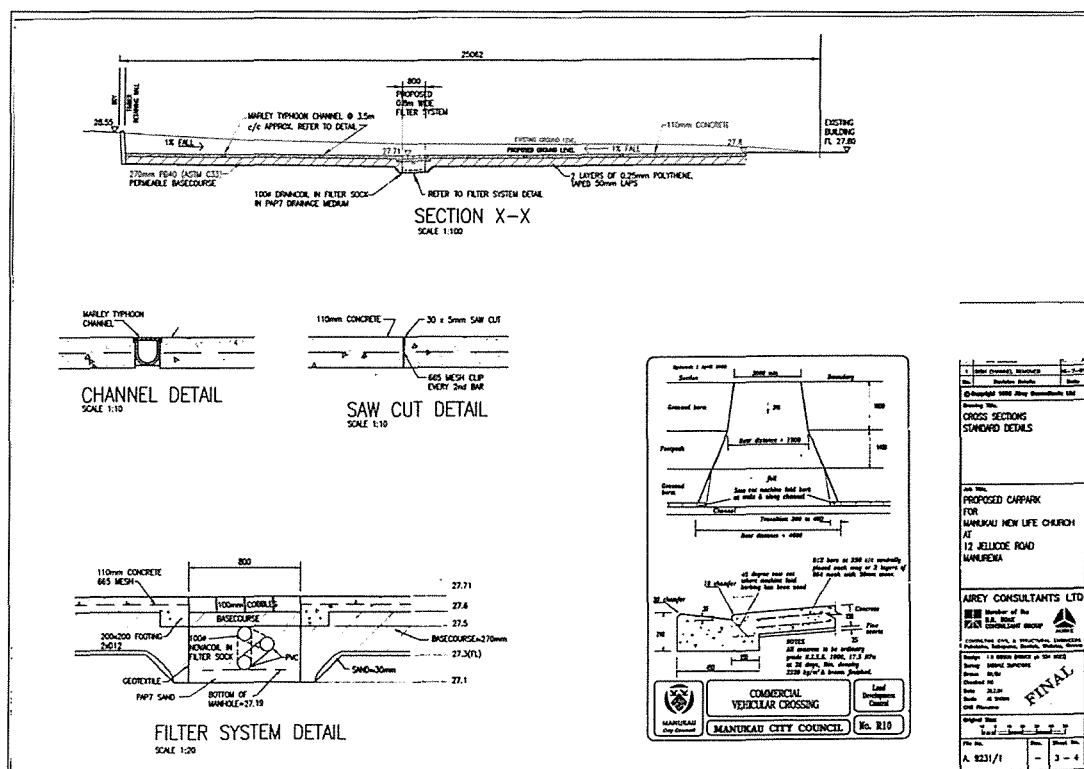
CROSS SECTION OF FINAL DESIGN
